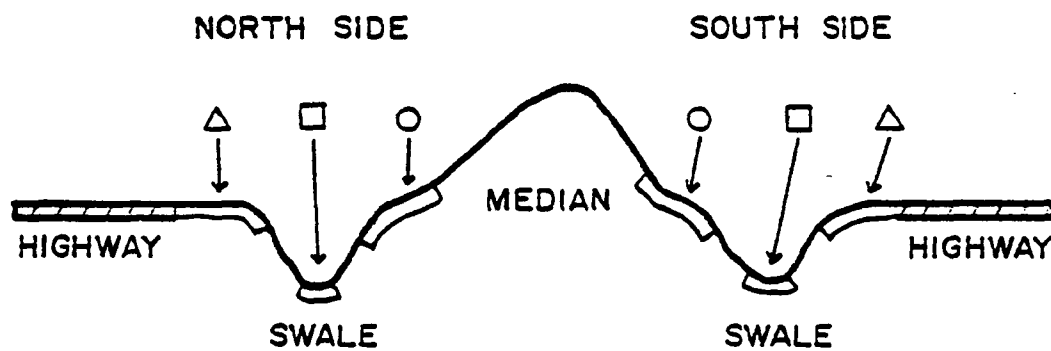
Cross-section of Route 234 grassed swale site (not drawn to scale).
